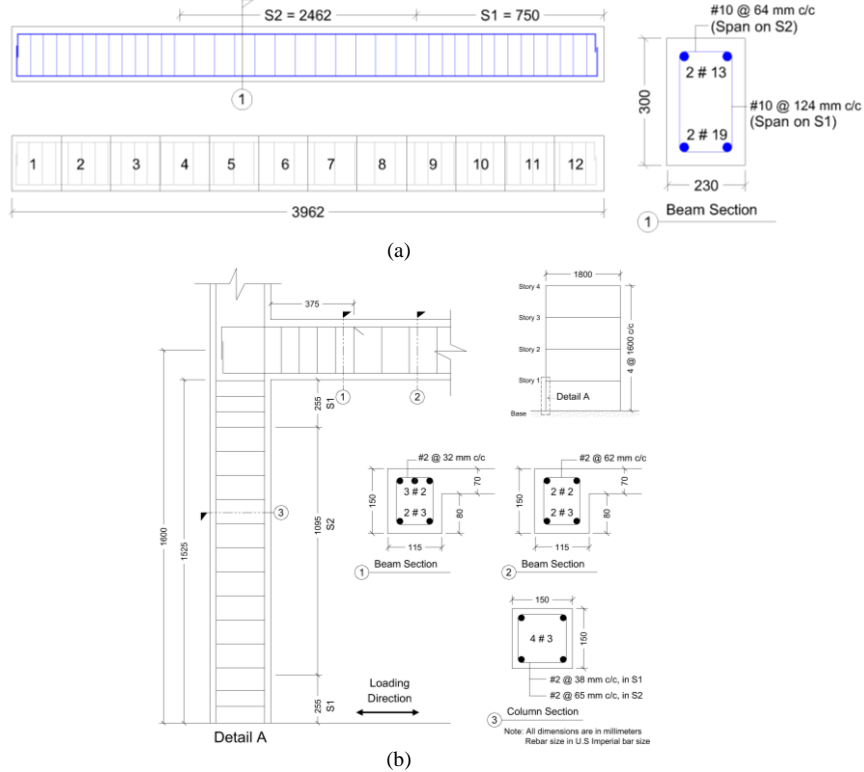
Reinforcement details(a) RC beam (b) Shear frame
